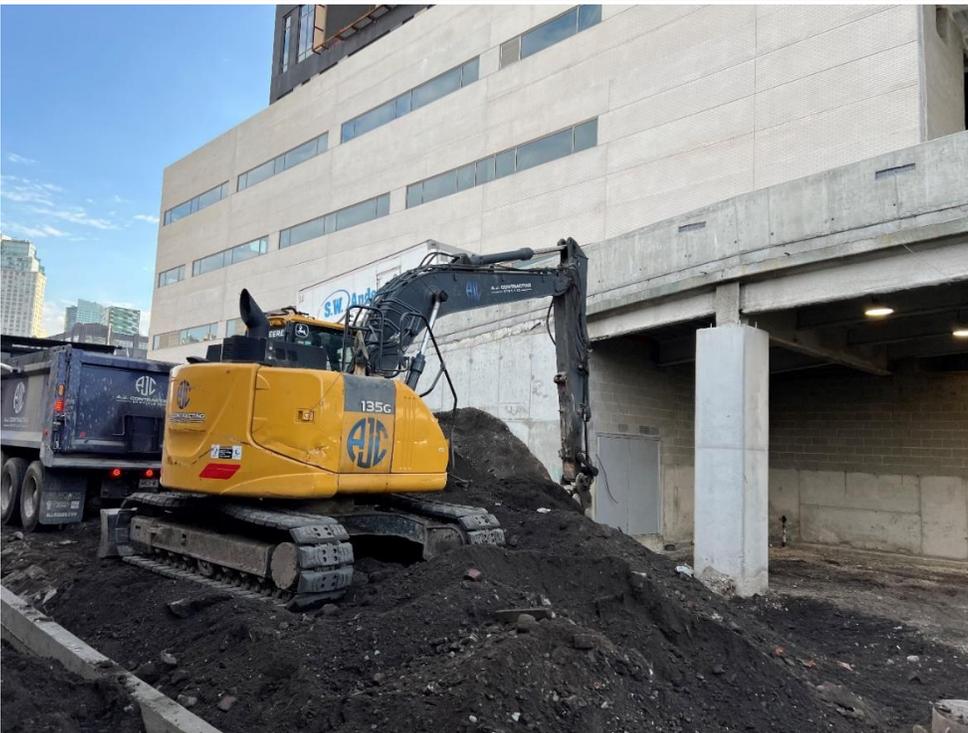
Excavator loading a truck with soil, facing northeast. Soil was not approved for off-site disposal. 03/20/2024
